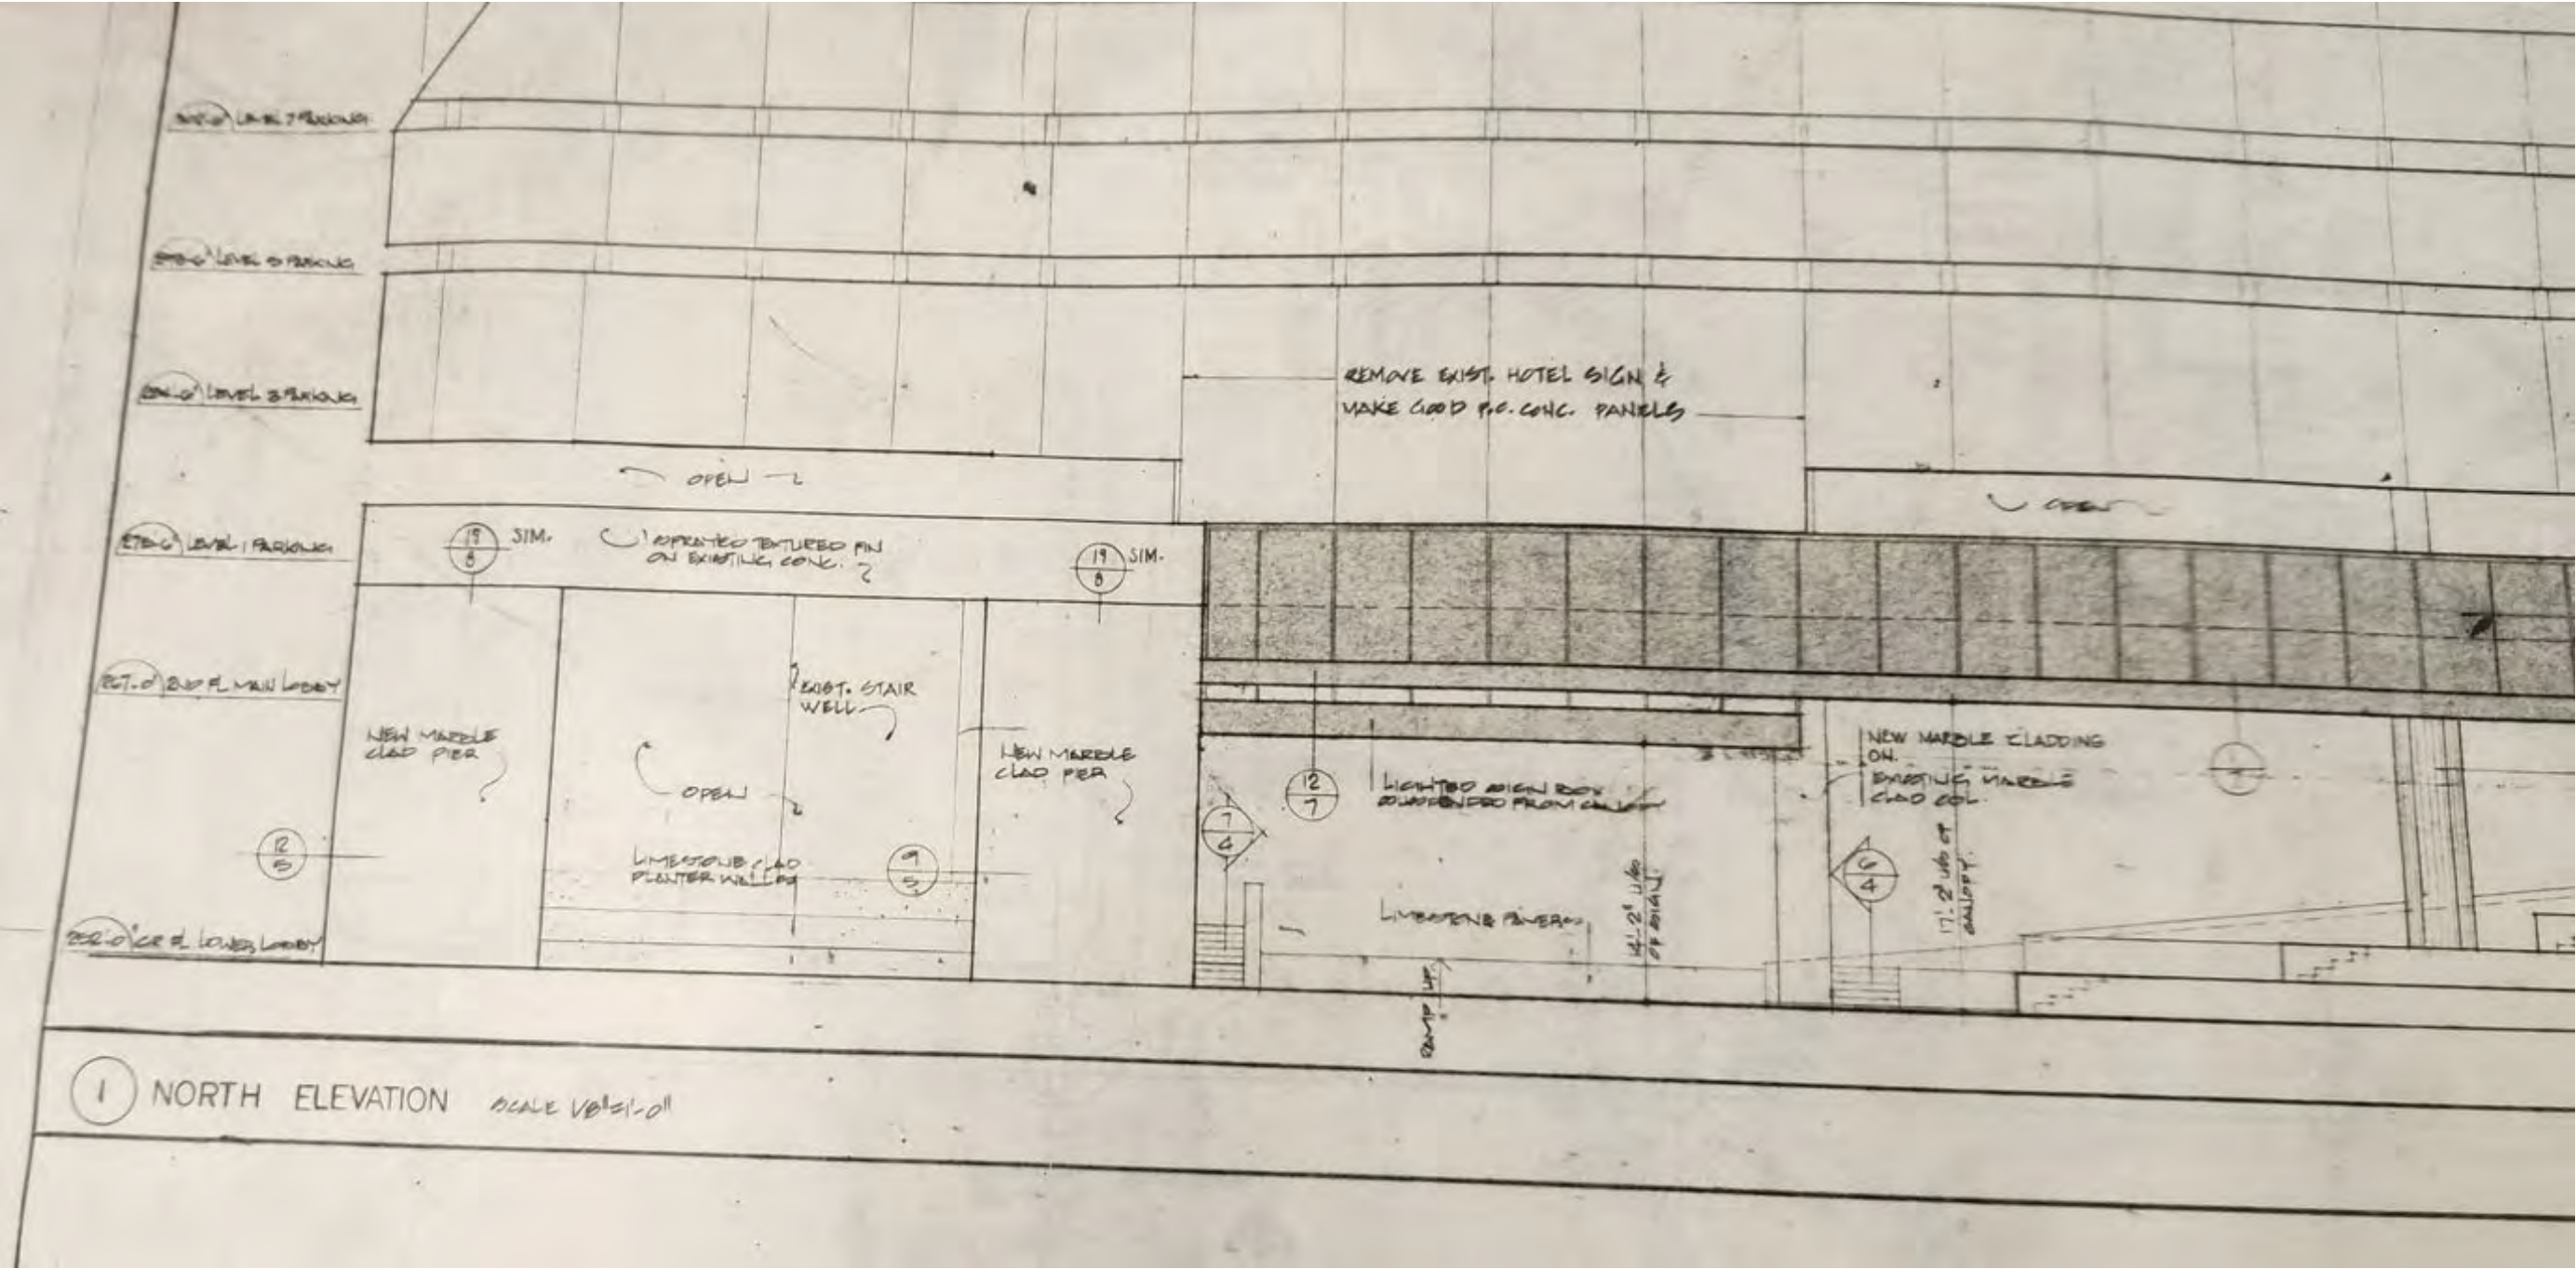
Detail of drawing showing proposed changes to hotel entrance on north elevation, east half, c. 1982 (Webb Zerafa Menkes Housden Partnership Architects).
